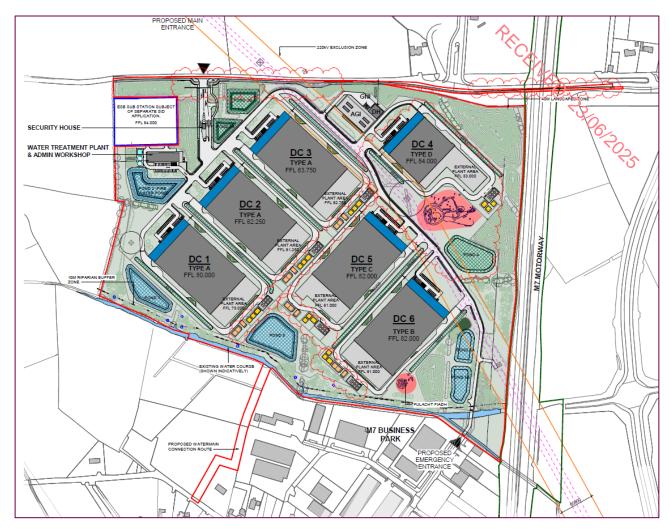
Amended Overall Proposed Site Plan (extract of now submitted drawing 22217-RKD-ZZ-ZZ-DR-A-1010-OVERALL PROPOSED SITE PLAN)
